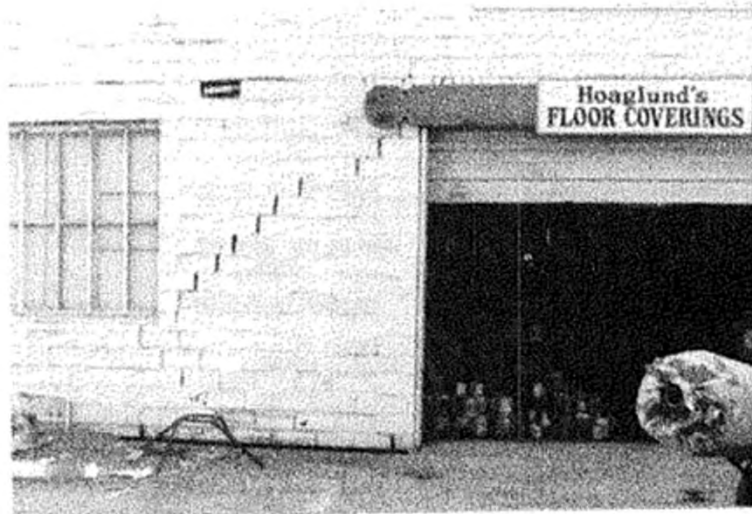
Unreinforced masonry wall with a stepped crack.
